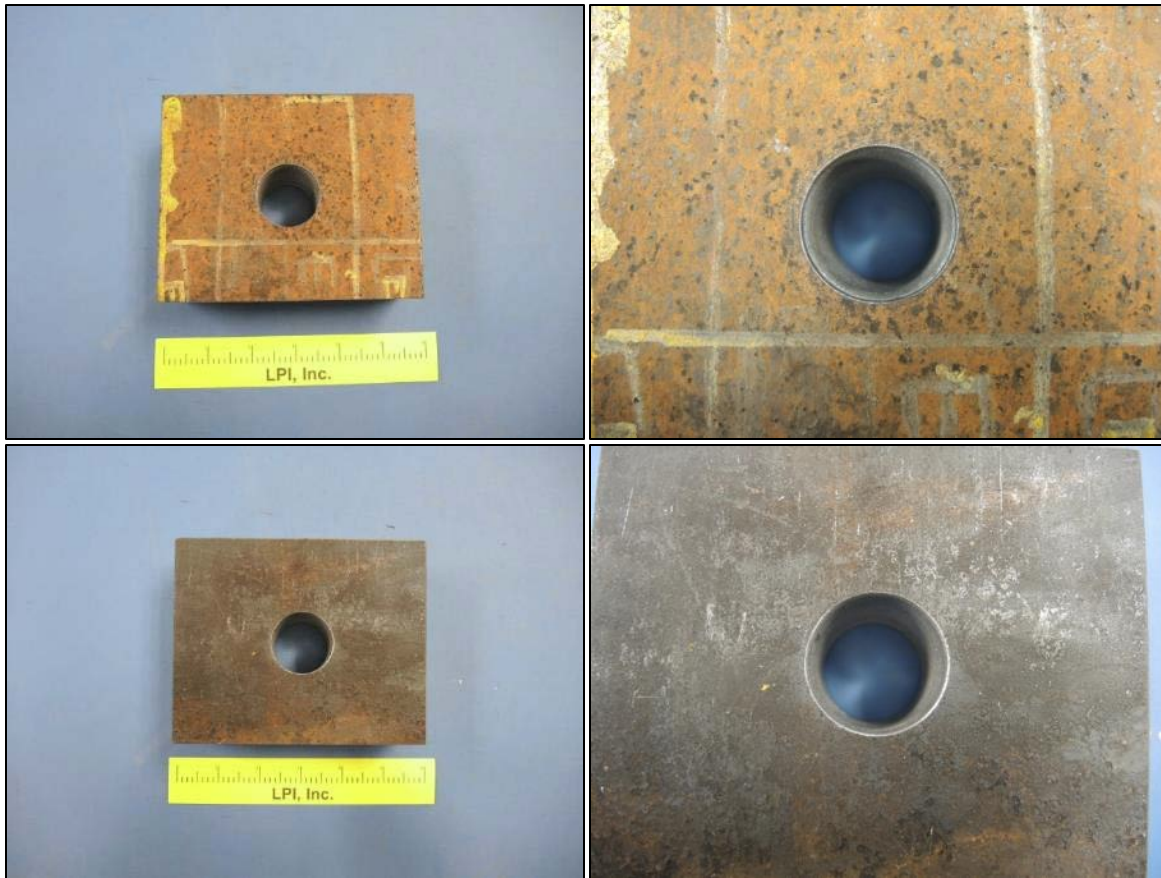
Overall and close-up images of the two bolt holes drilled in the sample repair plate.
